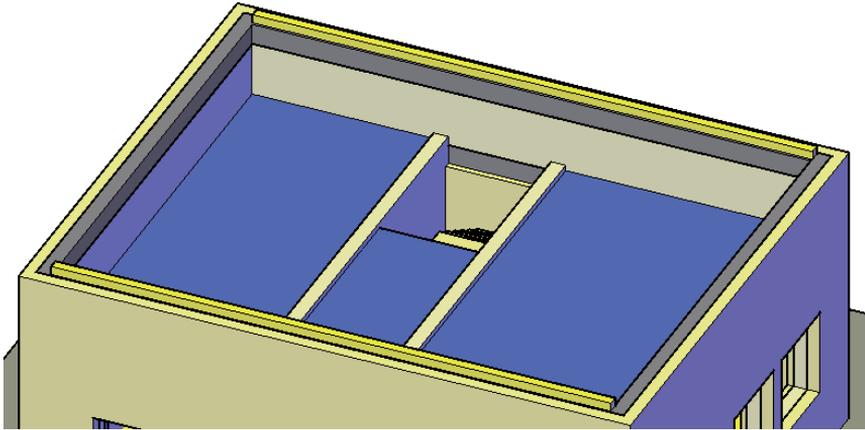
Modeled object with wall plate attached at ring beam ready to put the roof construction
